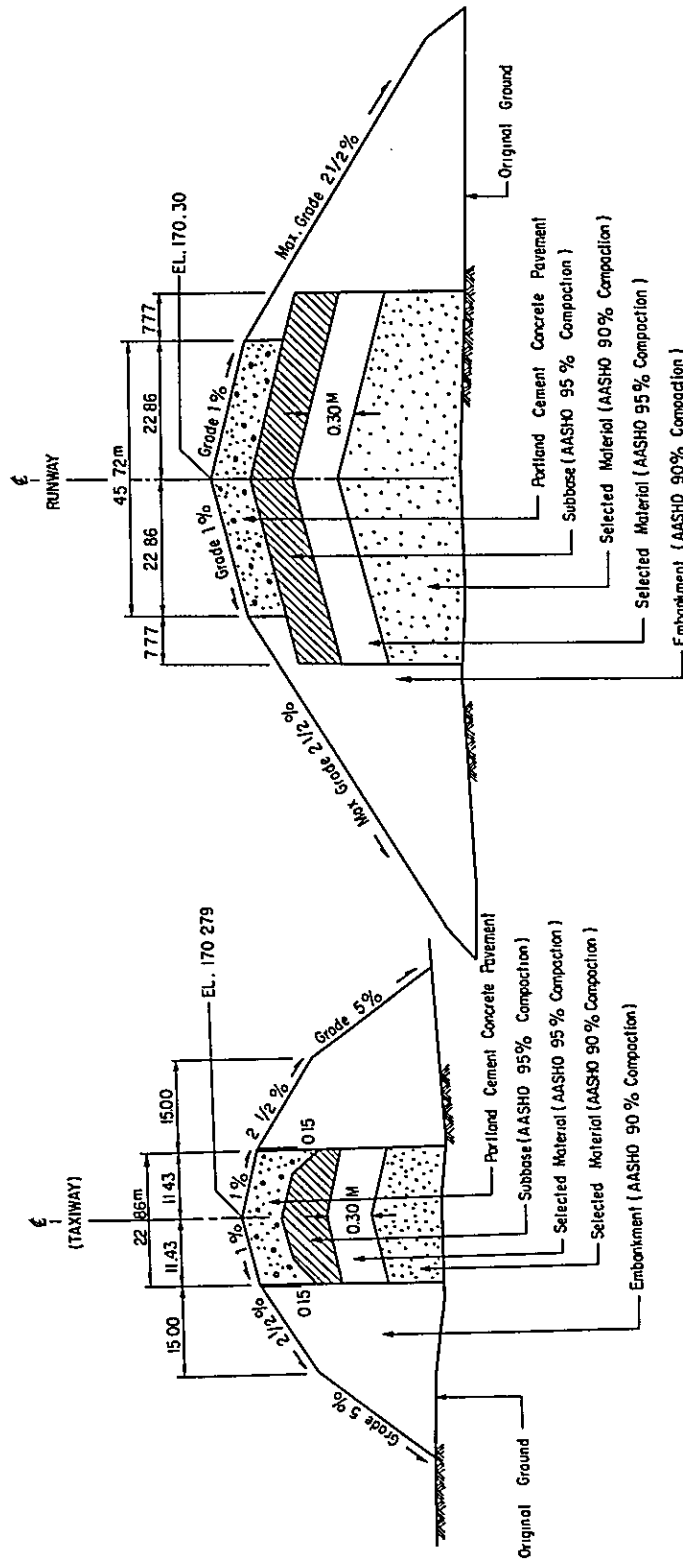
2 TYPICAL CROSS SECTION OF RUNWAY AND TAXIWAY
